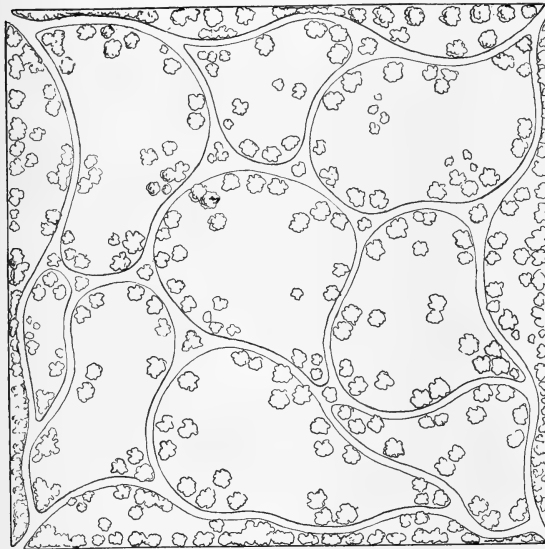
PLAN FOR A TEN-ACRE TOWN PARK.
